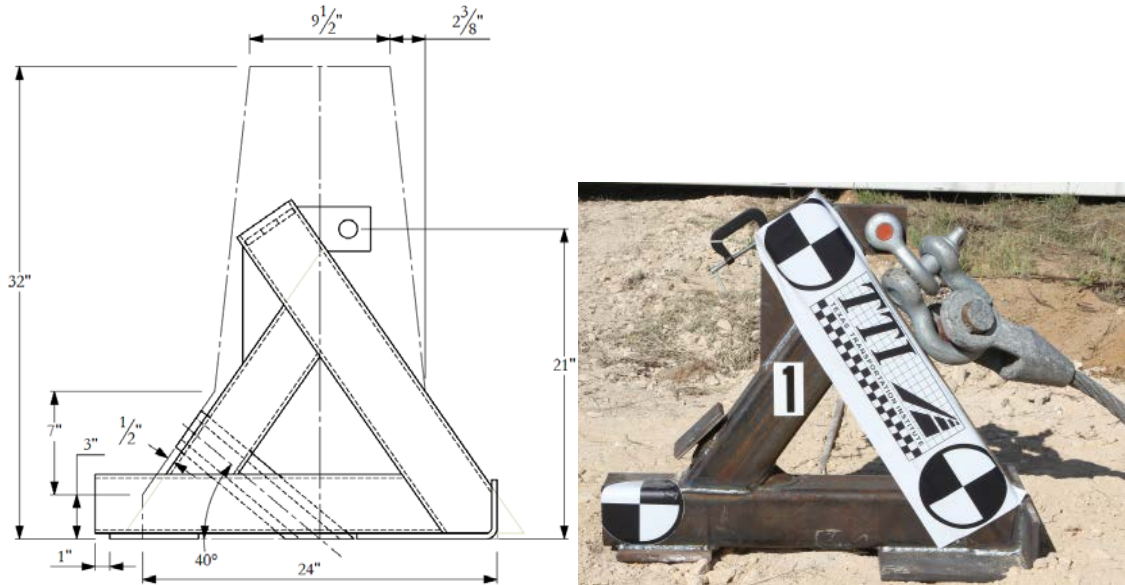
Frame built to hold anchoring pin at correct height and orientation.
